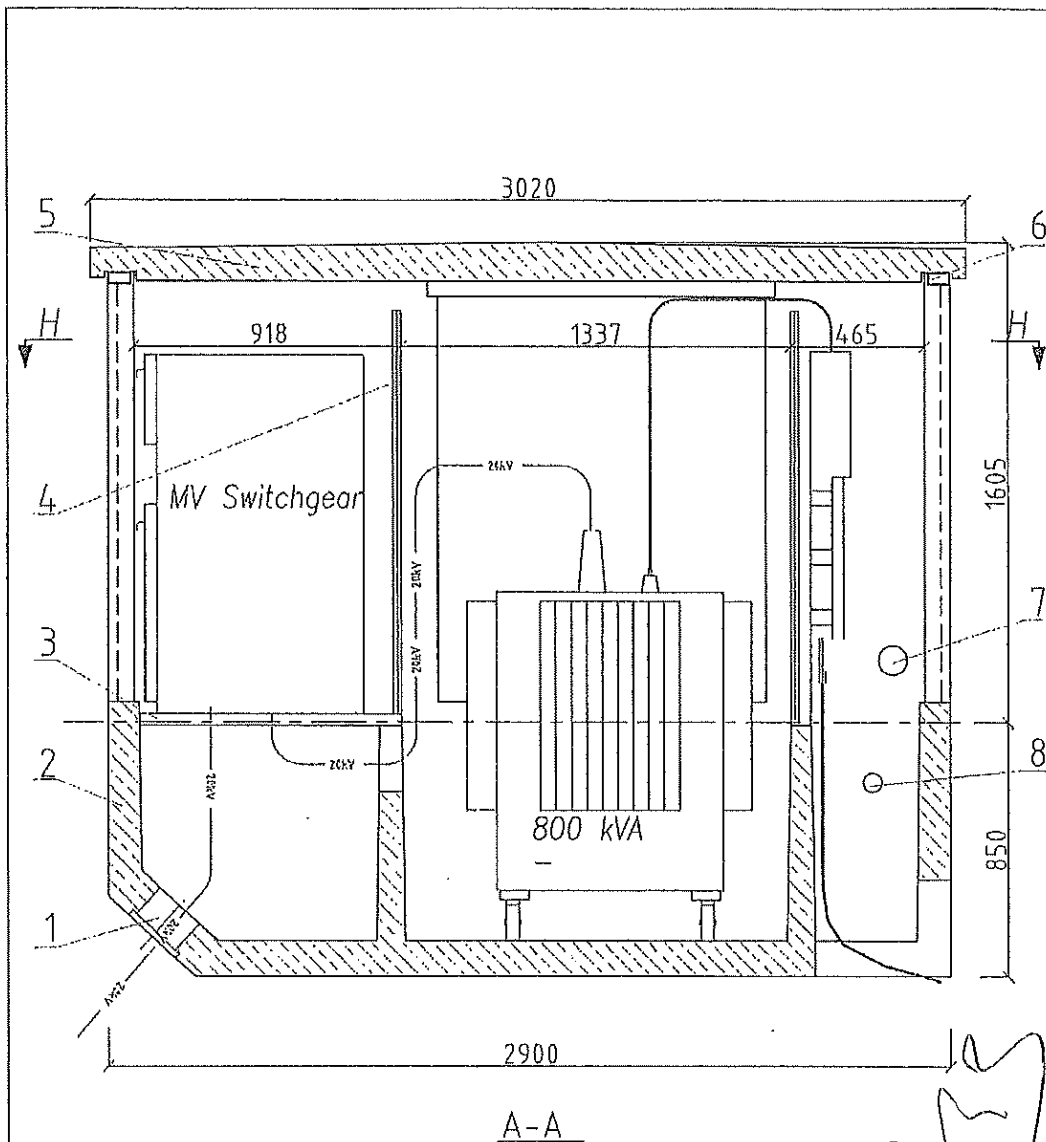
Aspect of 20/0.4 kV, 800 kVA Concrete Substation
